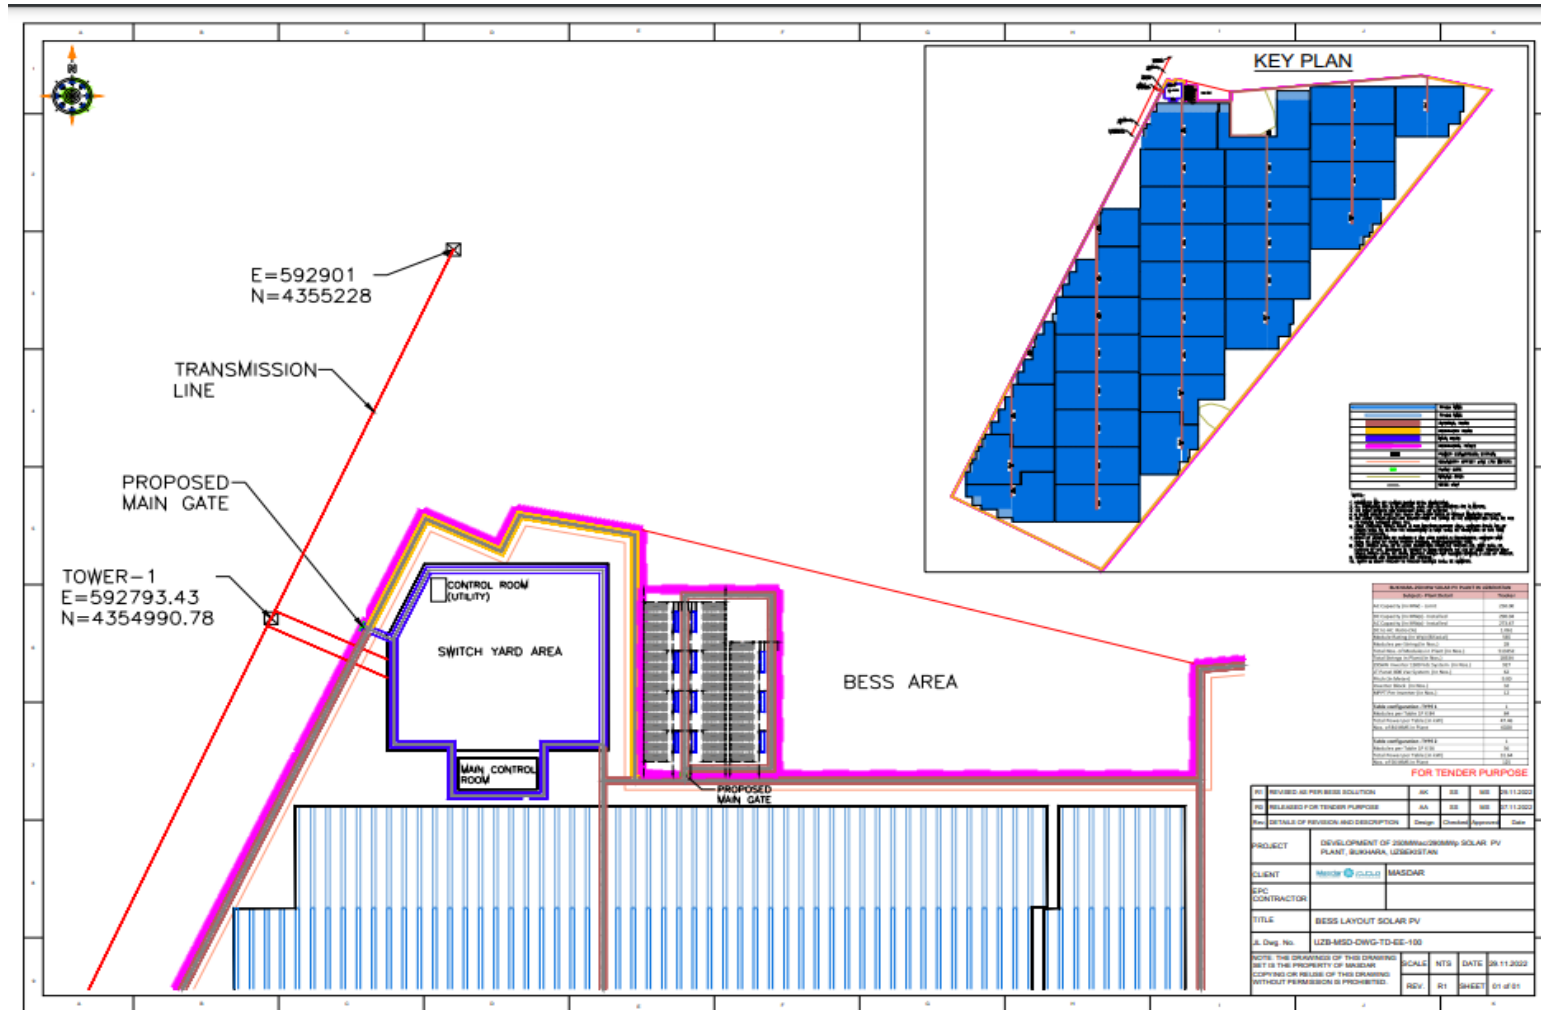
OHTL interconnection, substation layout (source: Typsa Scoping Report 2021)
